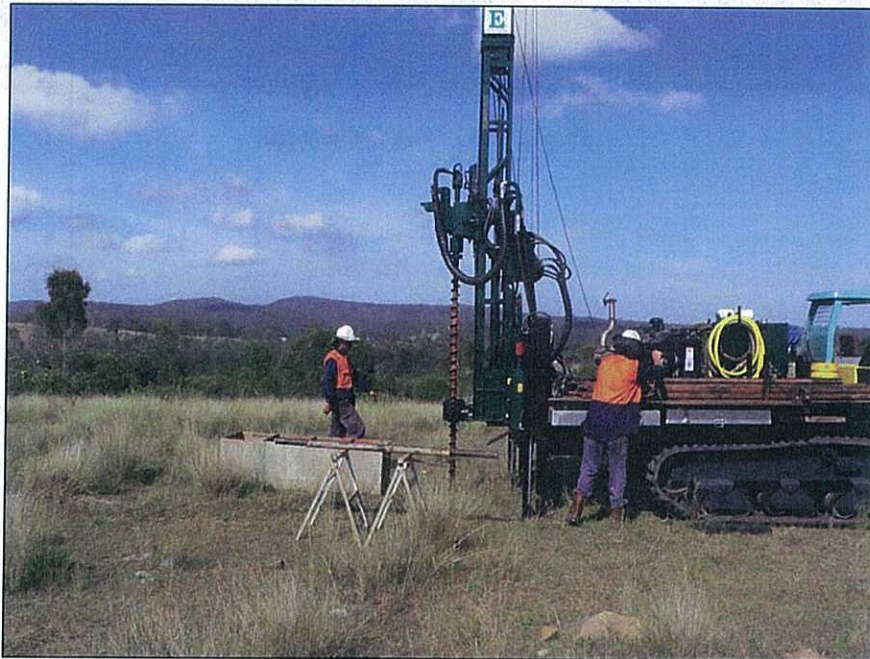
TYPICAL SITE VIEW SHOWING DRILL RIG IN OPERATION
